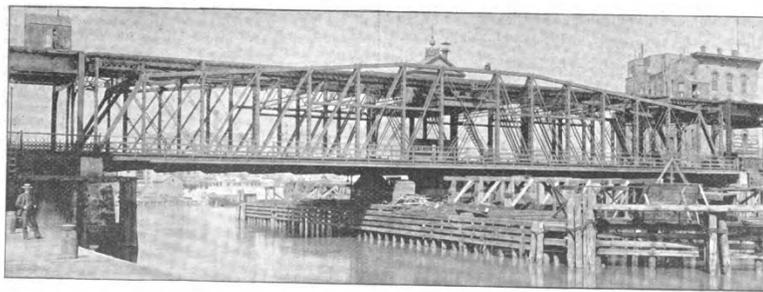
Tracks of the Lake Street Elevated Railroad Company on Lake Street Bridge.
